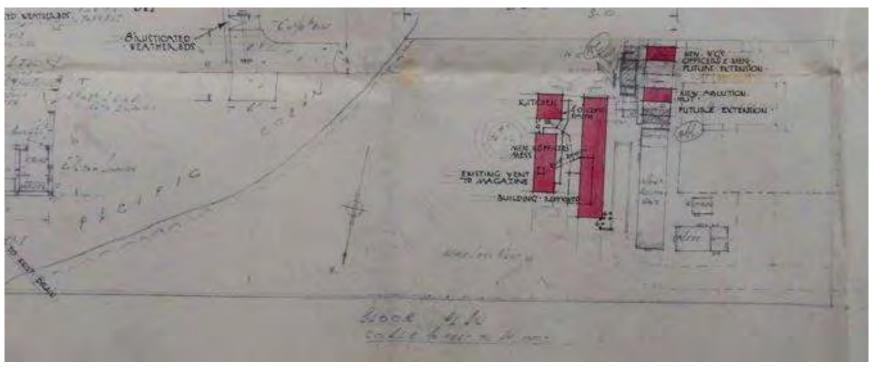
Enlargement of the plan of December 1939 showing building locations. Note that north is at the bottom of this plan. (Source: NAA, SP155/1, DEF22647E)
